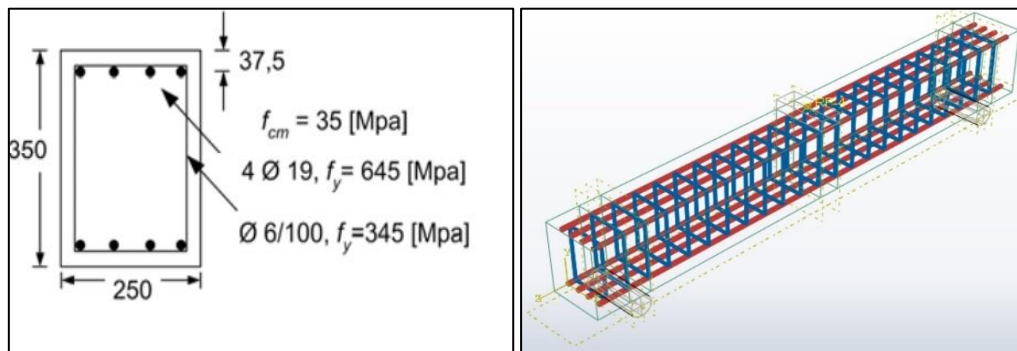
Reinforced concrete beam details, Maekawa 2005[58]
